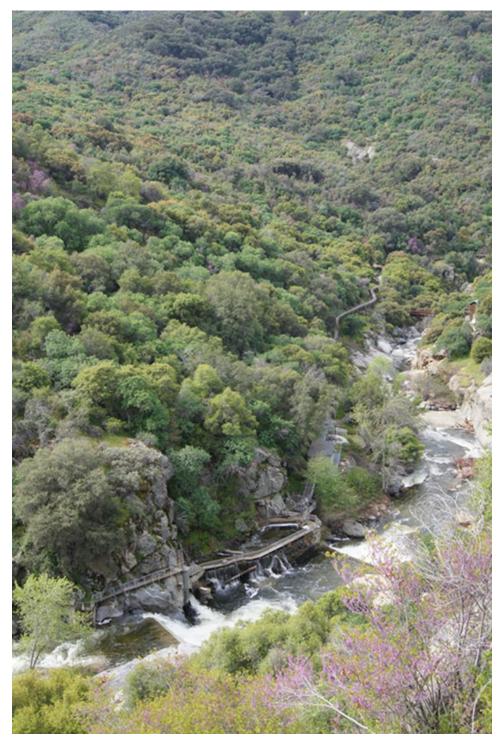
Kaweah No. 1 Diversion Dam, sandbox, and flowline on the East Fork Kaweah River as viewed from <u>below</u> Mineral King Road. Camera facing southwest. April 17, 2018.
